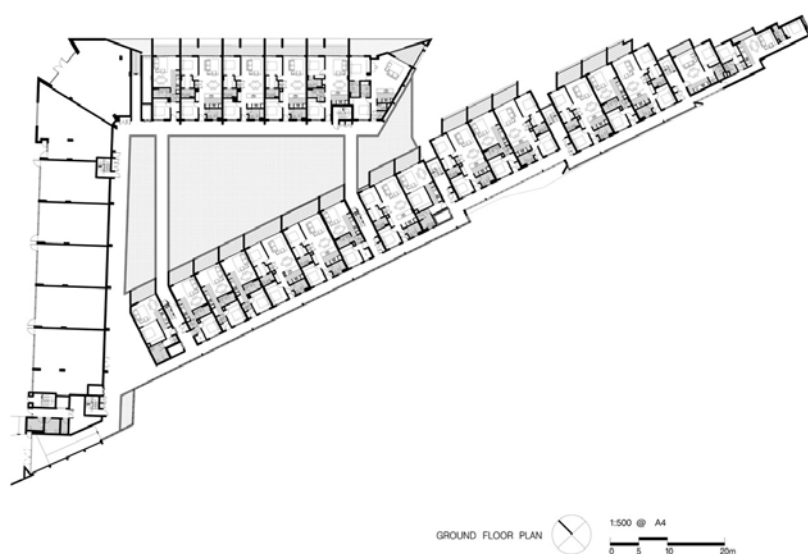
Ground floor plans (source <https://www.candalepas.com.au/home/projects/revolution-apartments/>)
